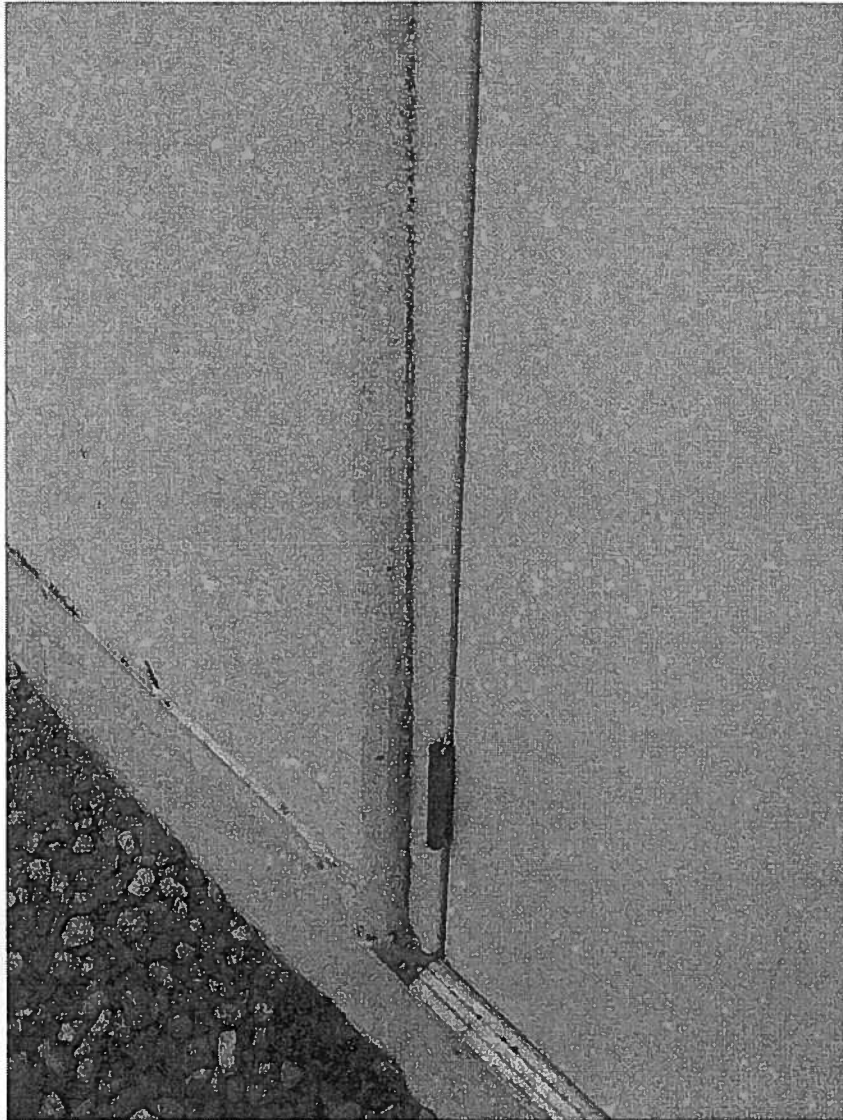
Rusting around roof access doorframe. There is also evidence of water ingress at the building interior at these locations.
